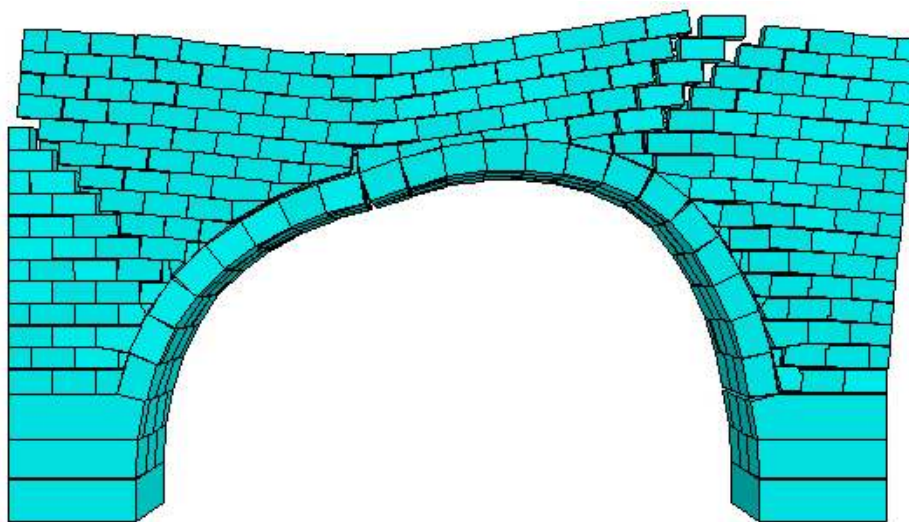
The deformed shape of a masonry arch bridge modelled using 3DEC (Courtesy of J. V. Lemos).
